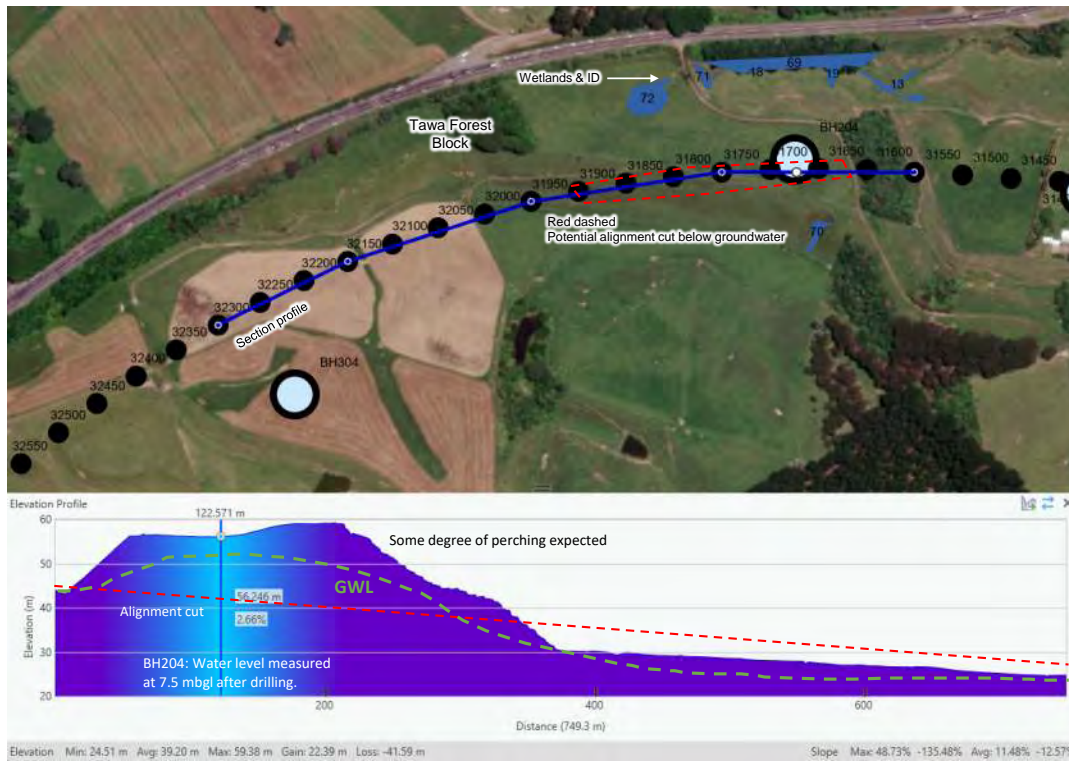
Site E - Cross-section and aerial plan showing interpreted GWL, alignment cut, wetlands and Horizons bores (shown pink)
